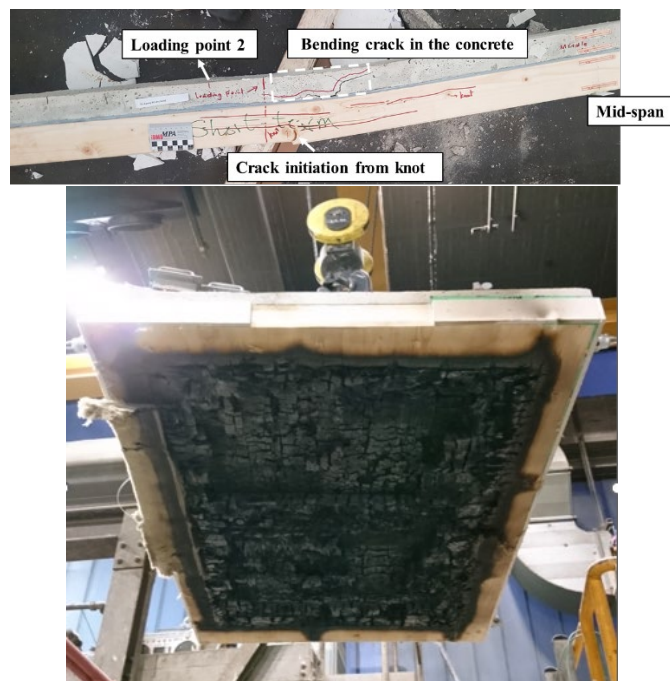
Failure mode of epoxy bonded glulam-concrete panel after four-point bending (up) and fire (bottom)
